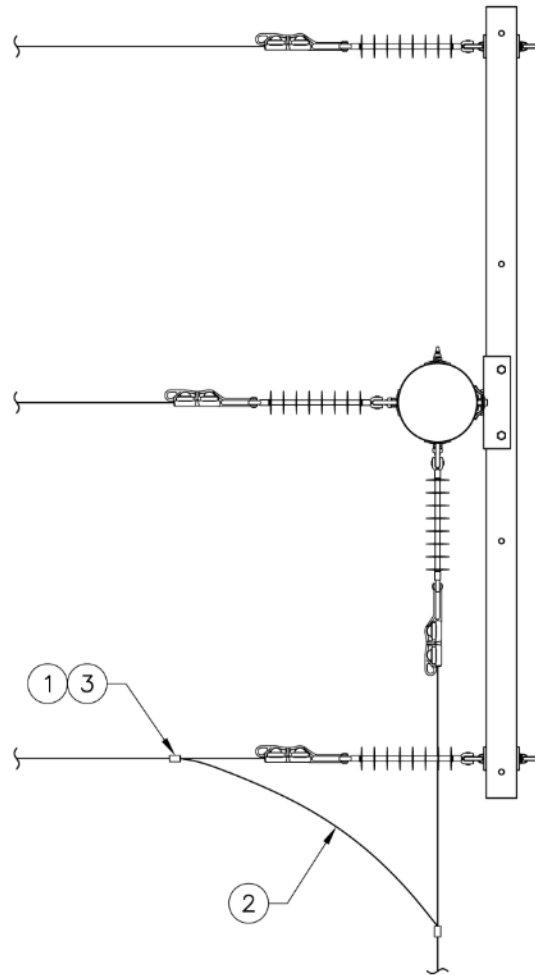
Single-Phase Double Deadend 0°–60° Crossarm Jumper, Top View
